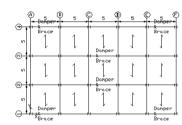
10.R.CD.1 & 10.R.CB.1 plan
